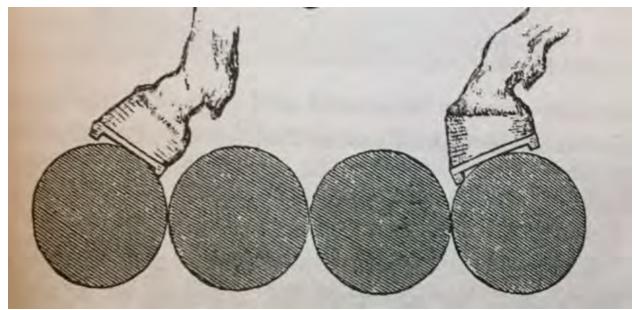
Foot-hold on the Cobblestone Pavement, Source: Frank Grant Johnson, The Nicholson Pavement, and Pavements Generally, Fig. 7. New York: W.C. Rogers & Co., Printers and Stationers, 1867.
